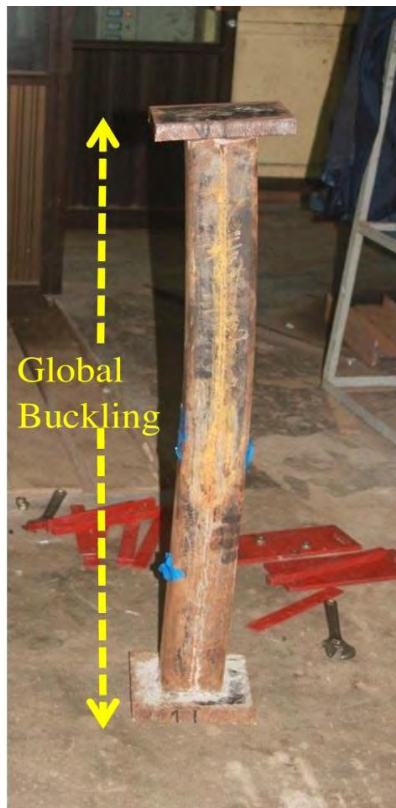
Typical failure modes of eccentrically loaded CFST column
